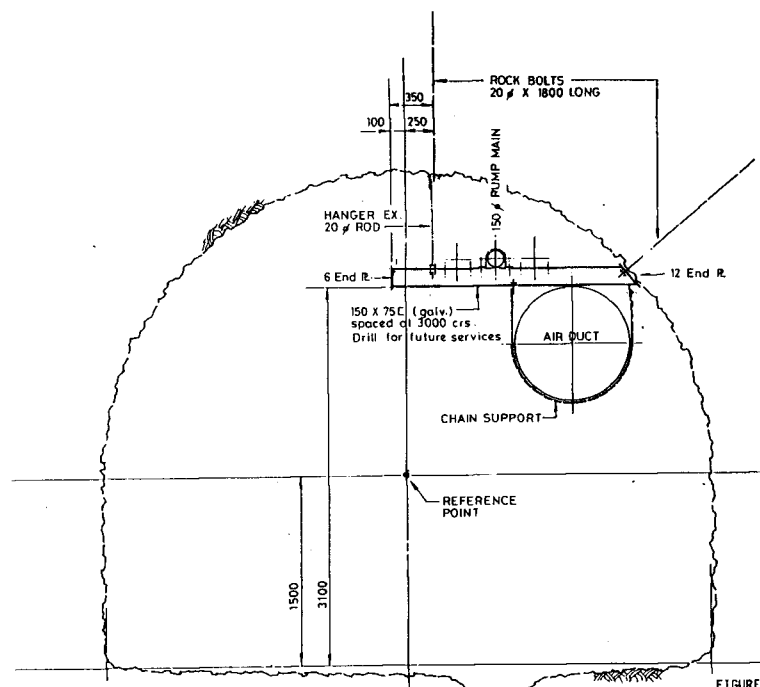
TYPICAL DRIFT CROSS SECTION
